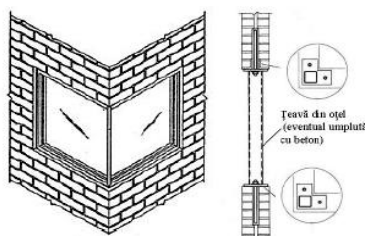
Reinforcement of corners if the masonry rests directly on the window structure [97]
